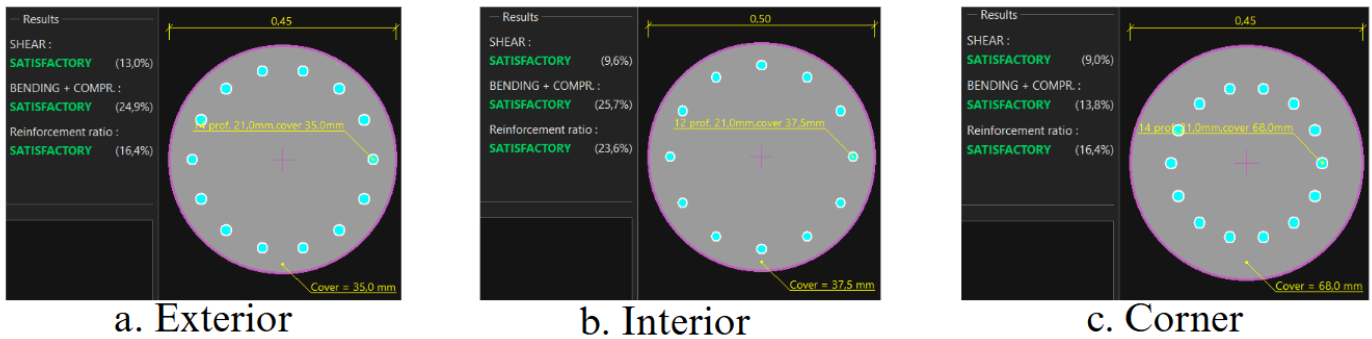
Single Pile Reinforcement in Geo5.
